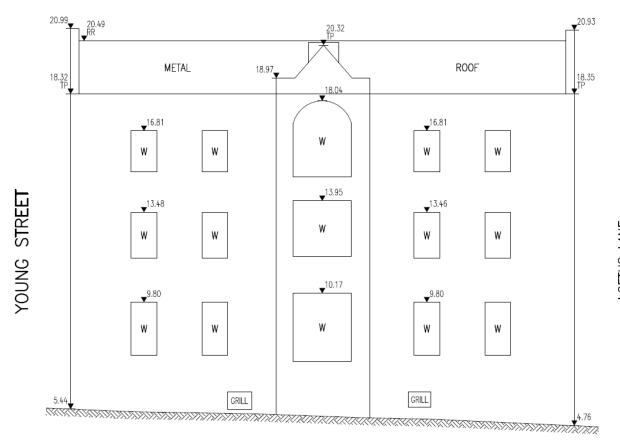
VIEWS OF THE EASTERN FAÇADE
